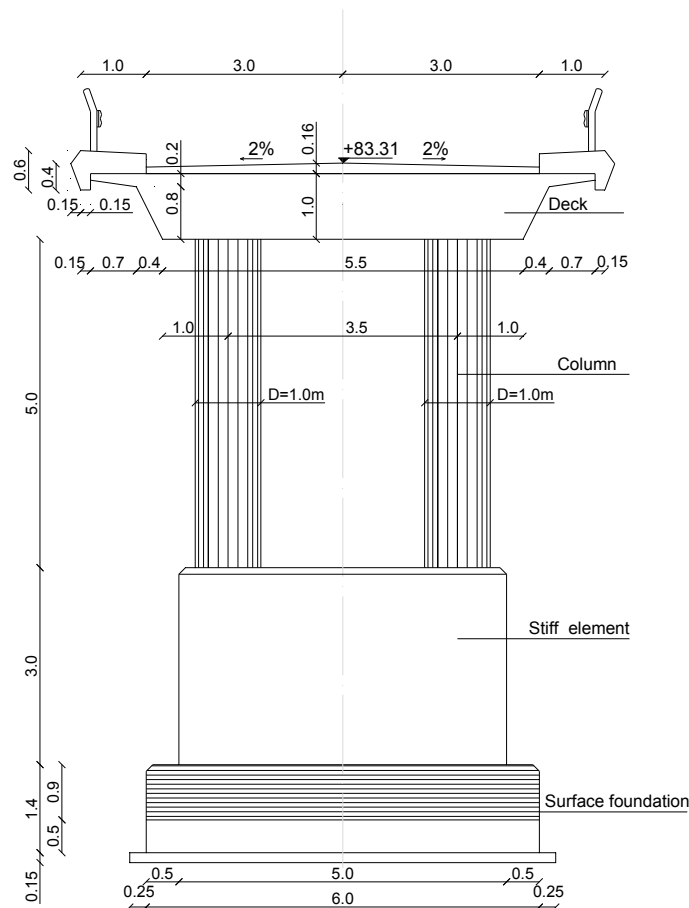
Overview of the foundation-pier-superstructure system cross-section.
